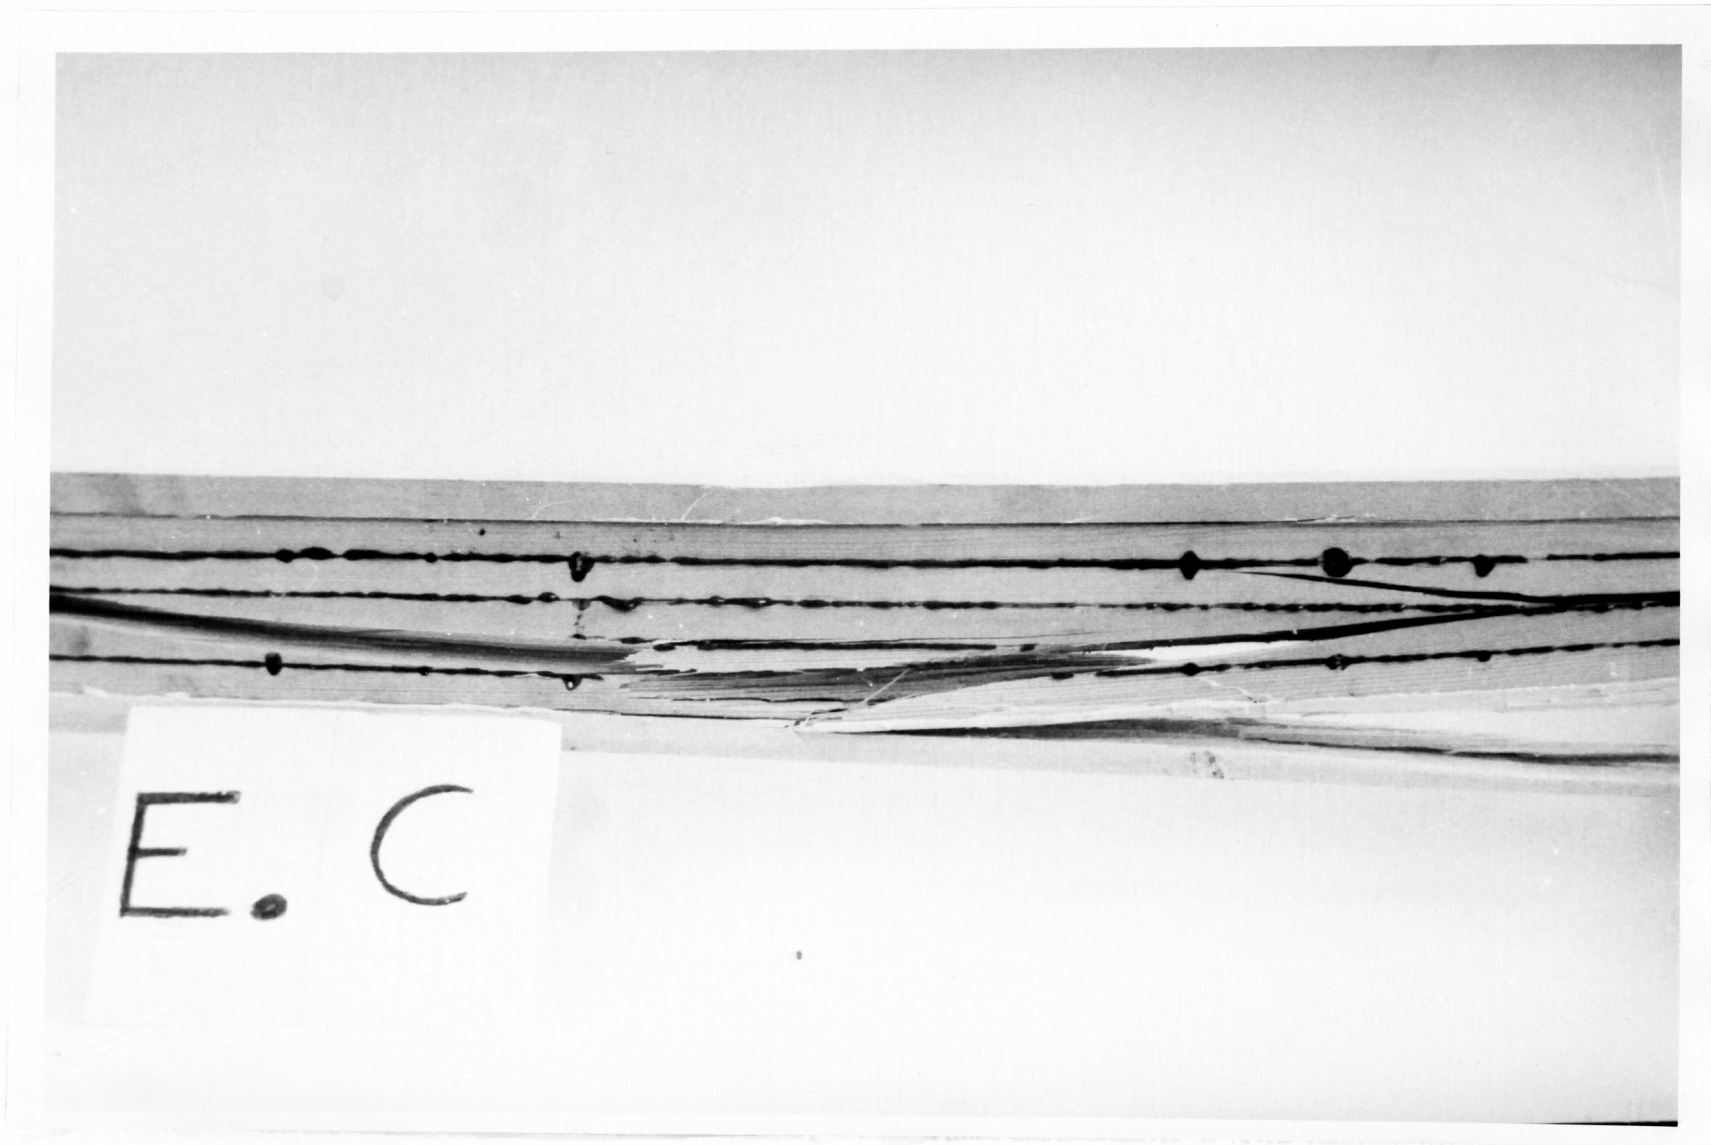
FIGURE IX TYPICAL FAILURE OF THE EPOXY CONTROL BEAMS, TYPE C
